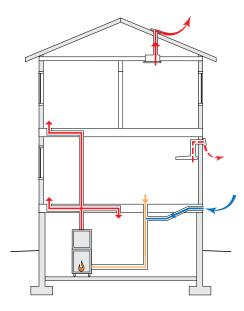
Schematic layout of a typical gas furnace system (with standard ventilation air arrangement)
